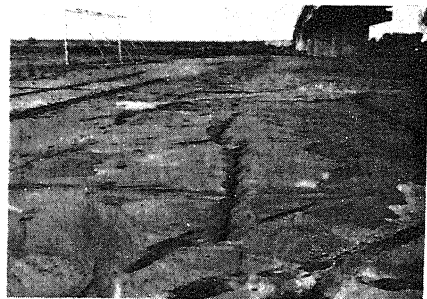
Sand Boils from Cracks on Ground near Pier 8, Yuragi Bridge (Natori River)
